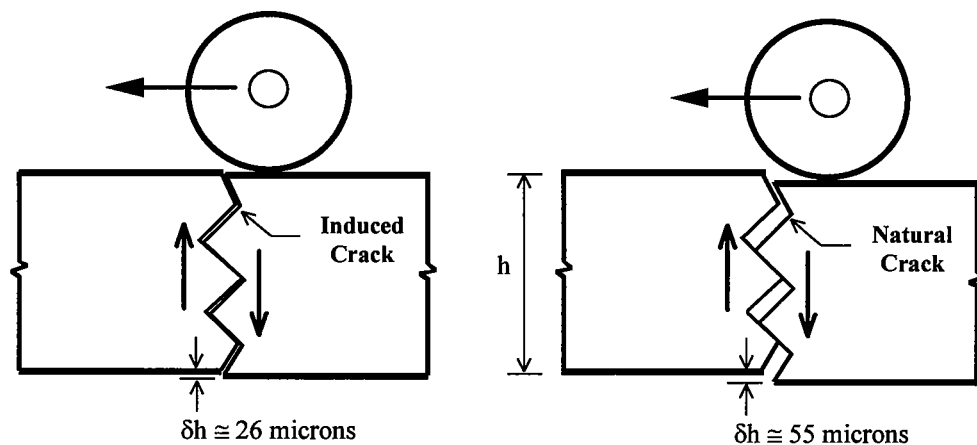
Shear slip across an induced and natural crack on the A11 pavement
